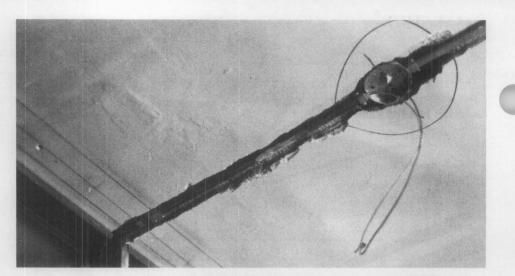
Channeled corridor ceiling with oval electrical conduit installed. Replastered channel matches existing ceiling, concealing new electrical distribution system for the entire building. Photo: William S. Donnell
